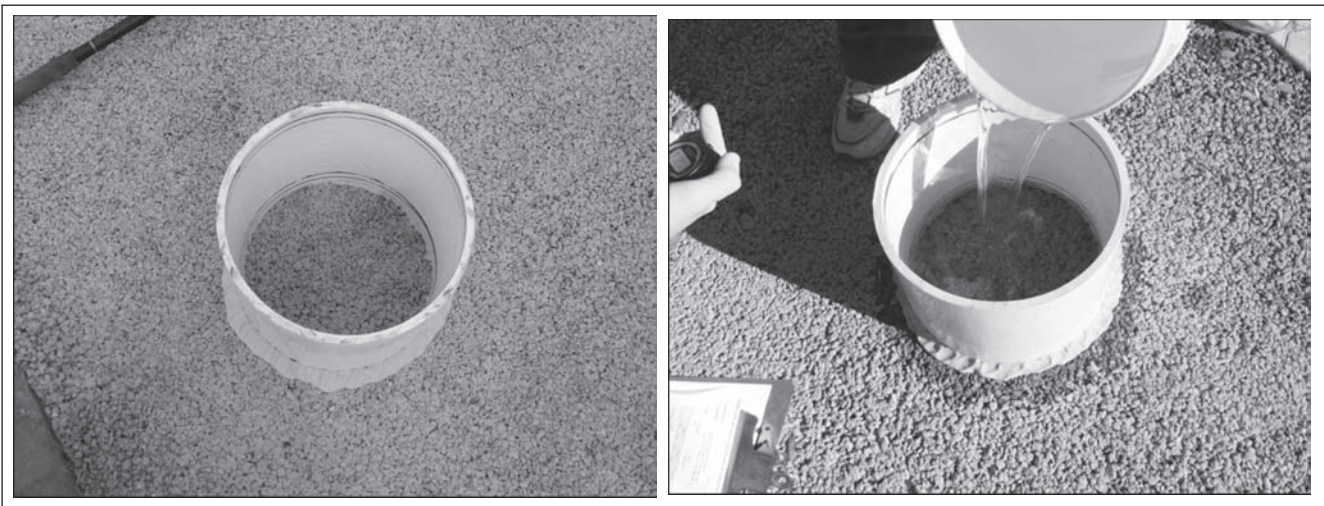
Infiltration rate testing of in-place pervious concrete (ASTM C1701-09)
